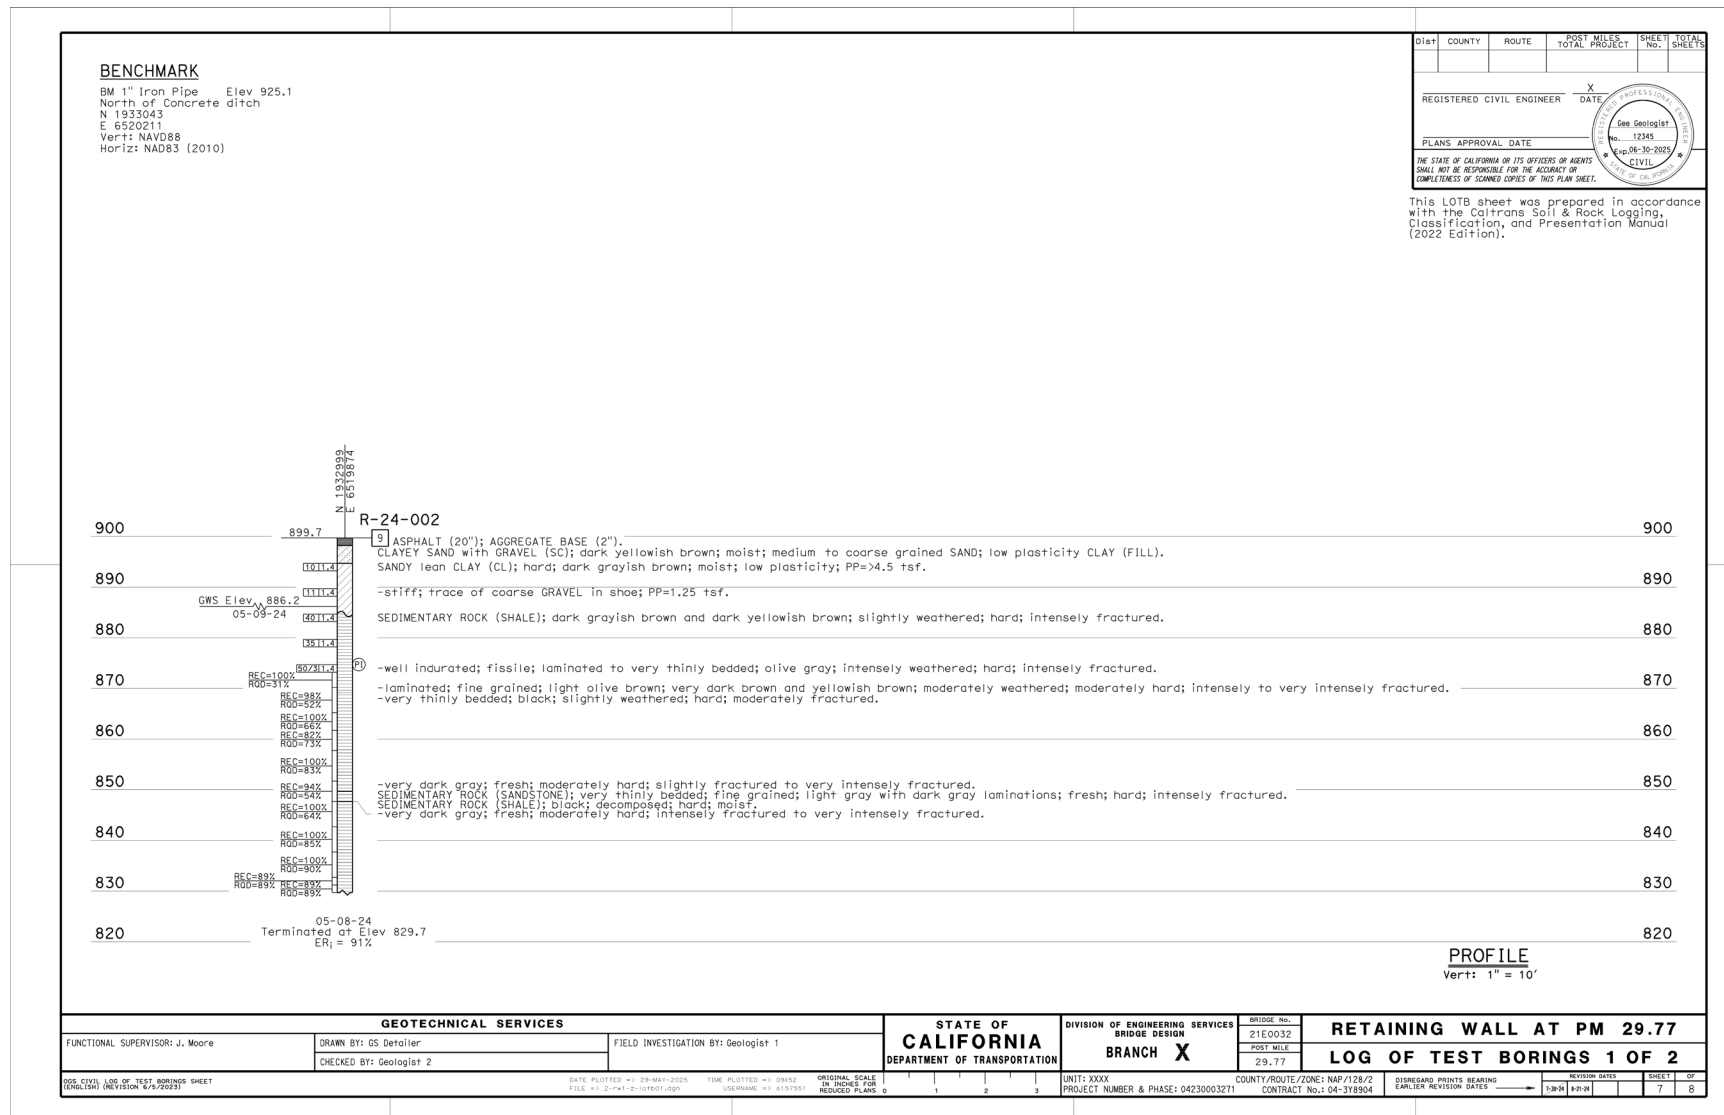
A.C.2 Log of Test Borings Detailing Example 1
